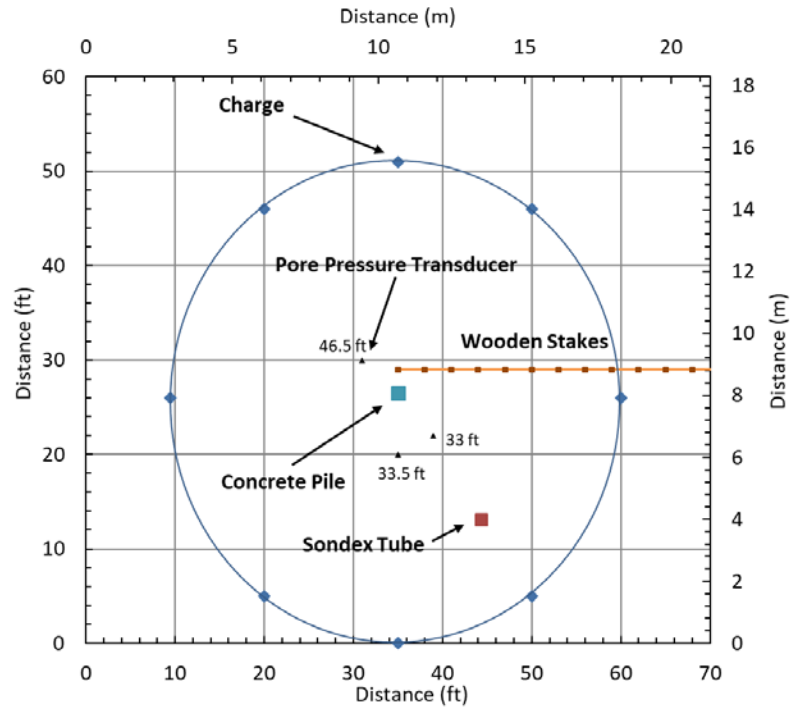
Profile drawing of test pile, blast holes, and instrumentation for a typical test pile/drilled shaft at the test site.
